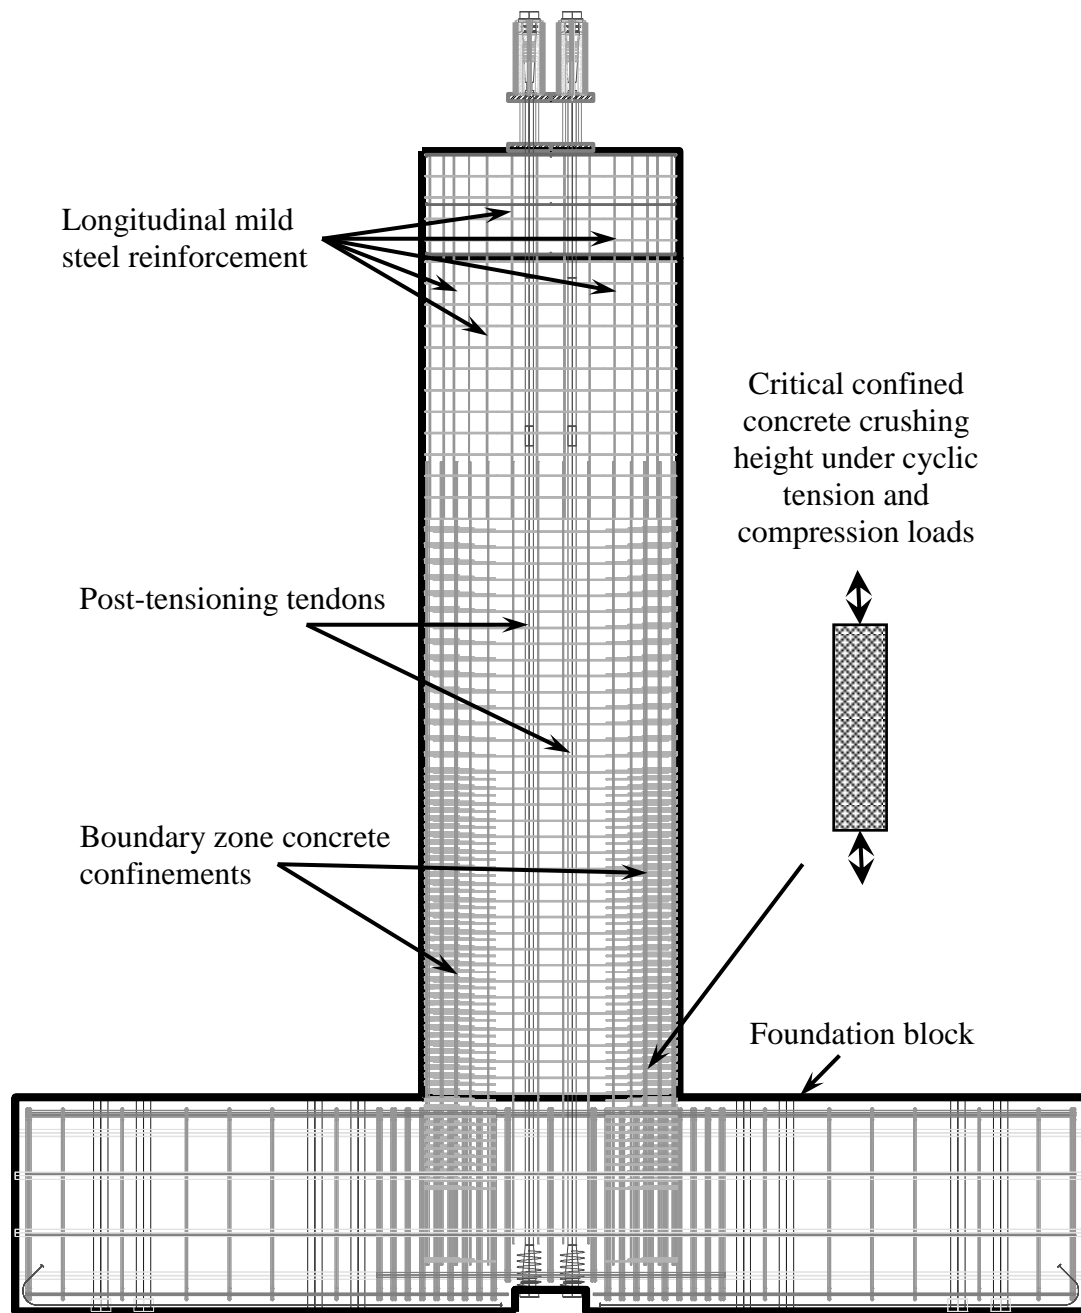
Unbonded PT CIP concrete special structural wall test specimen (Rivera, 2013)
